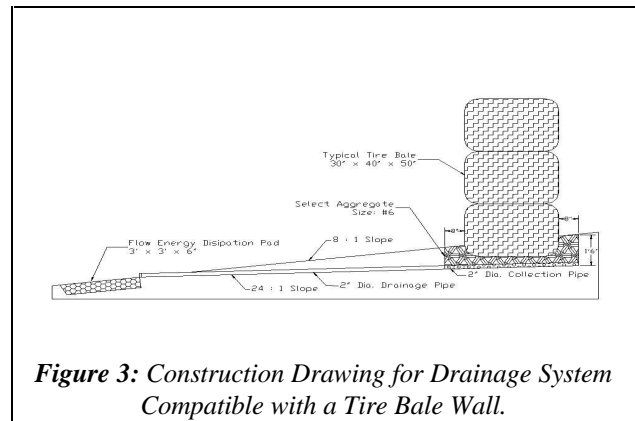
Construction Drawing for Drainage System Compatible with a Tire Bale Wall.
